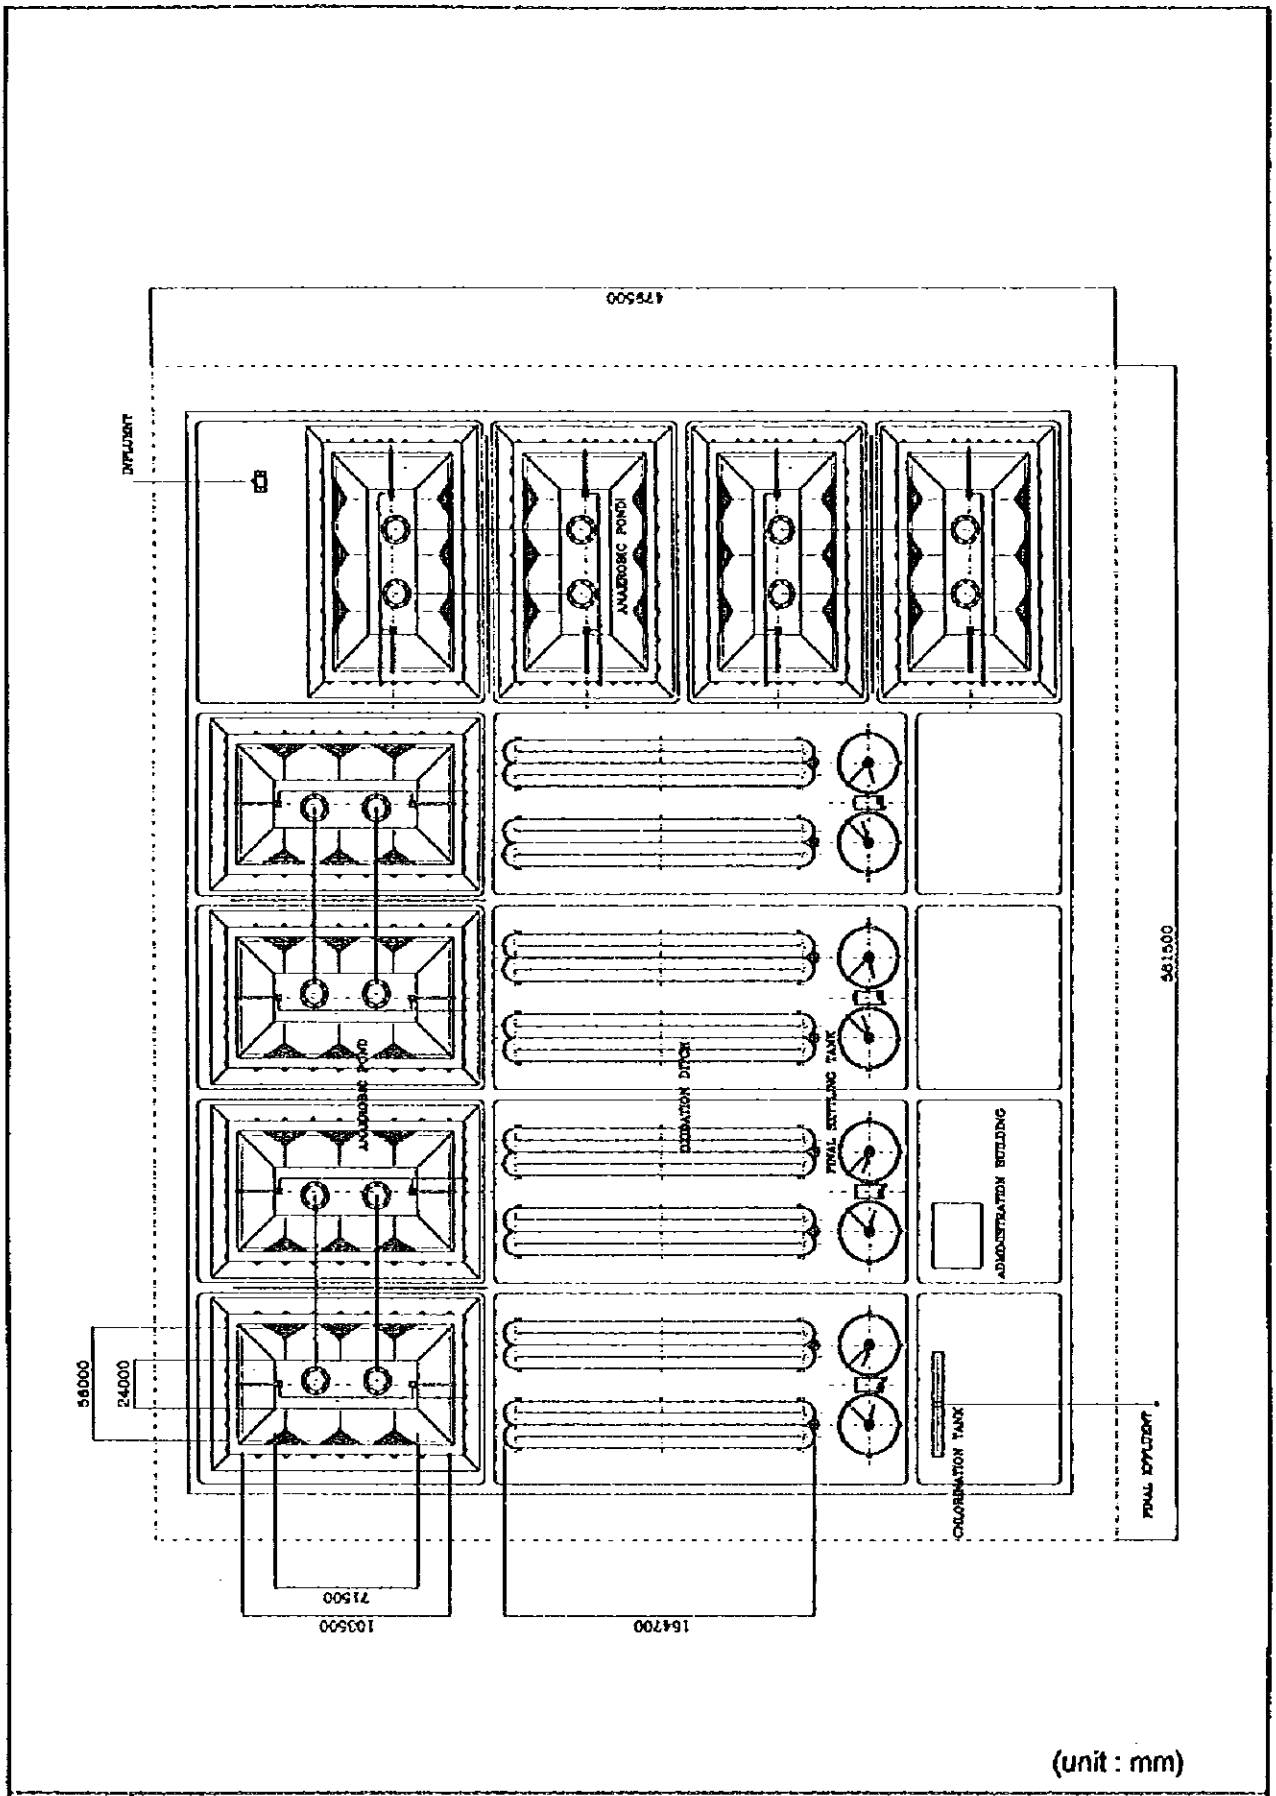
LAYOUT PLAN OF PROPOSED SEWAGE TREATMENT PLANT
